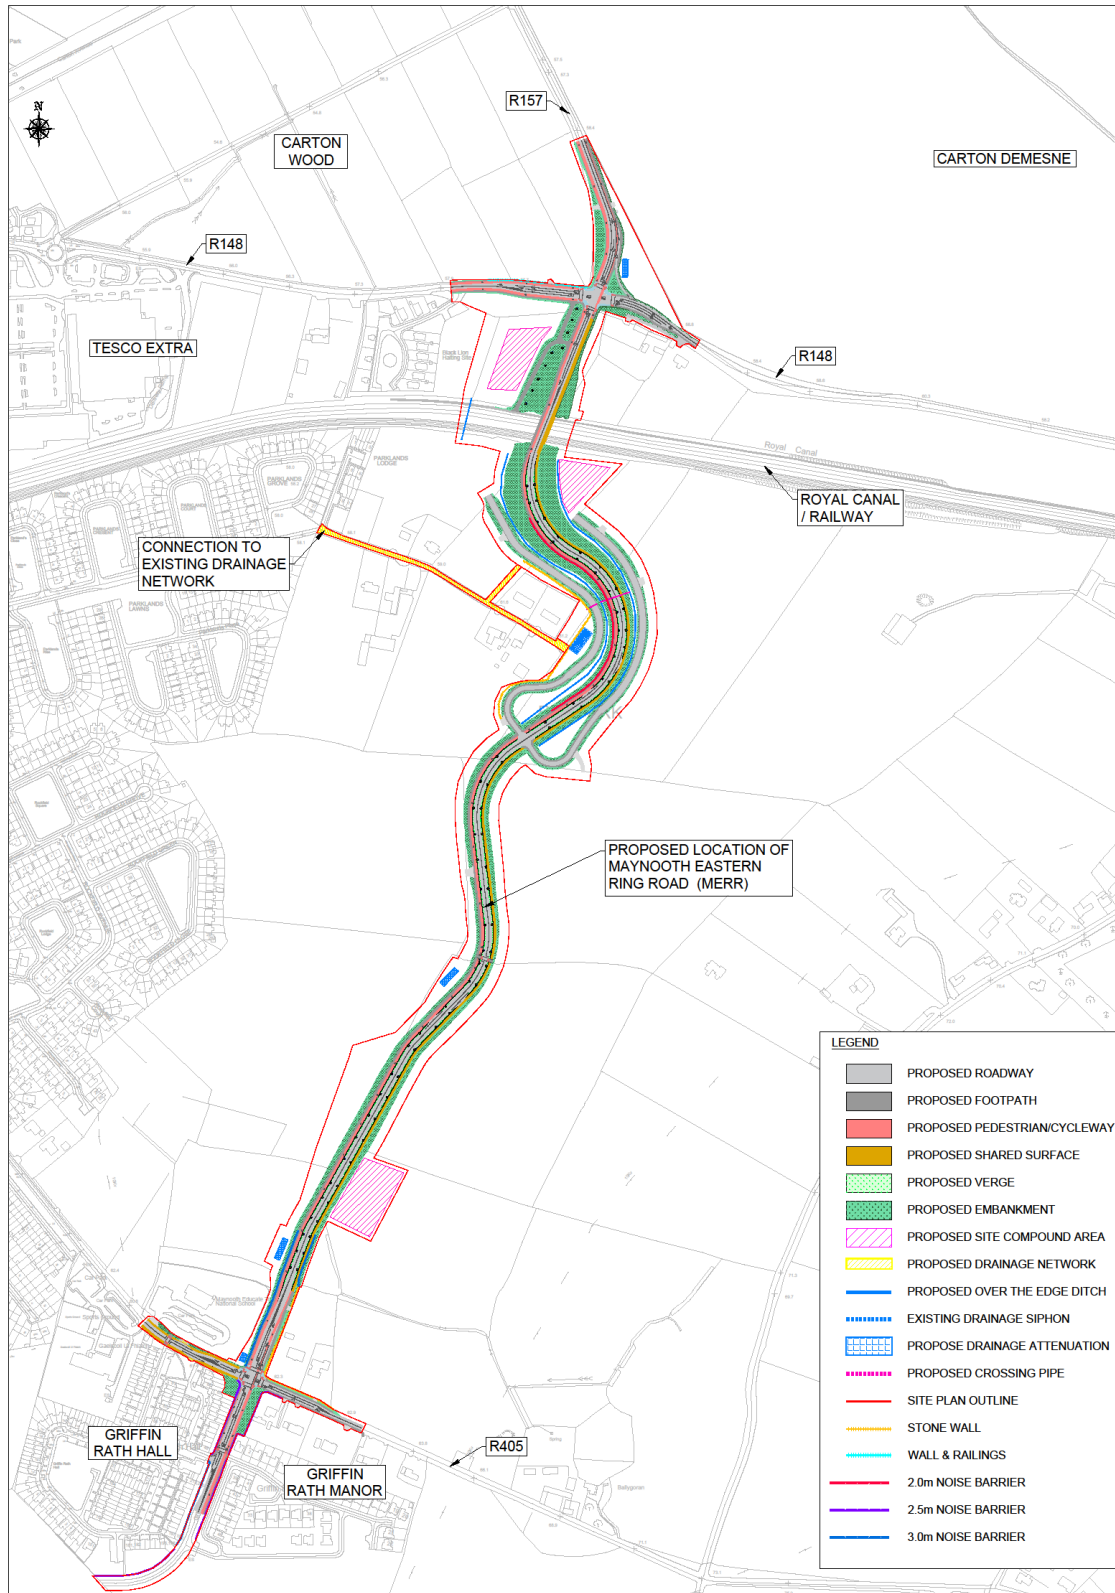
Proposed Alignment of Maynooth Eastern Ring Road
